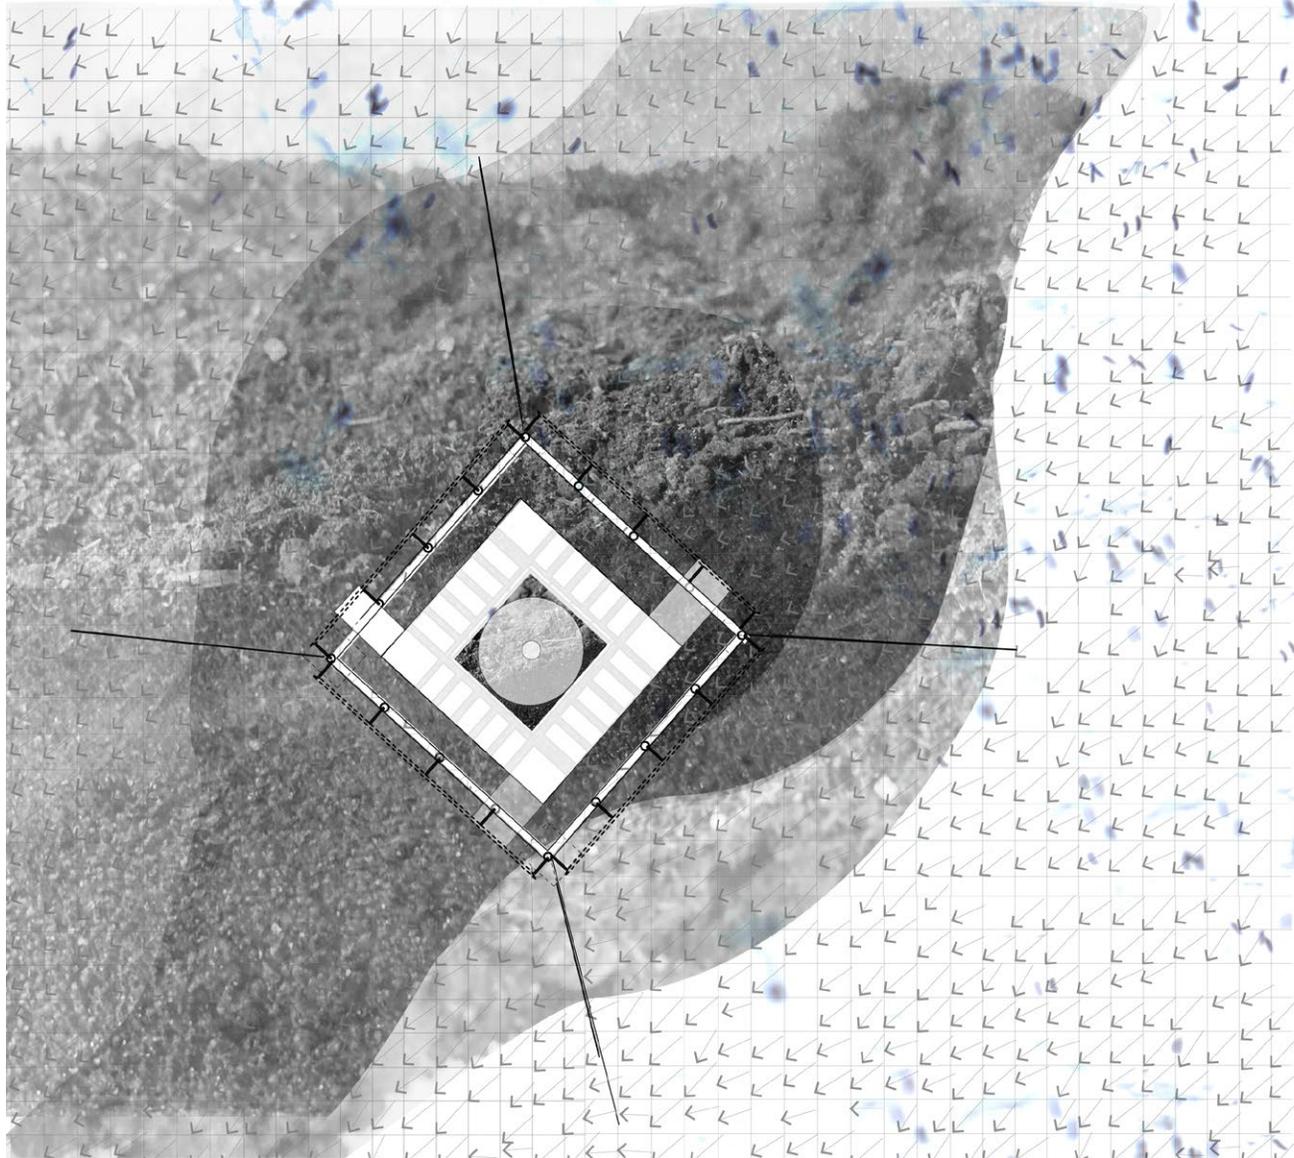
A plan drawing of a seed collector in Rouge Park.
